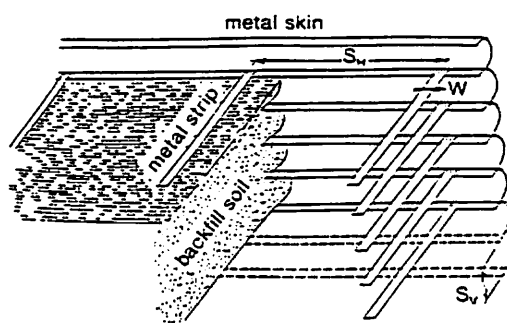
Metal facing for R. E. retaining walls (Vidal, 1978).
